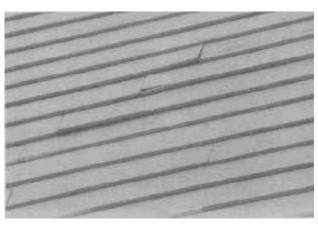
Due to inferior wood and inadequate finishing, some modern wood sidings fail in five years Note splitting near end joints, and also cupping and twisting.
